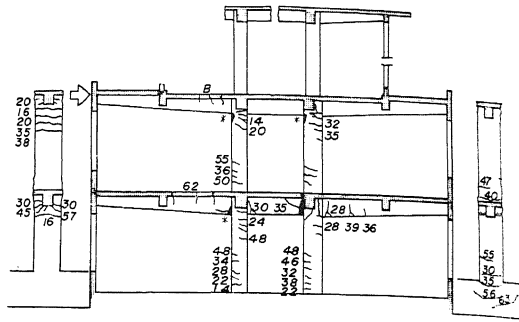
CRACK IN HAMAMATSU OPEN FRAME
